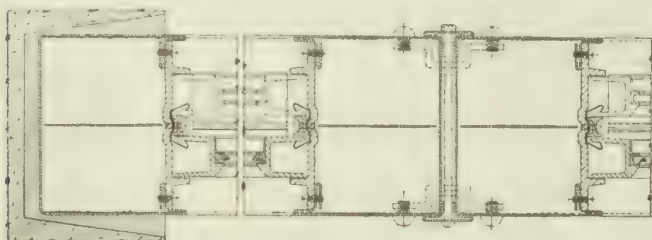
DETAIL OF COUNTERWEIGHTED TYPE SHOWING 1-PIECE MEETING RAILS
